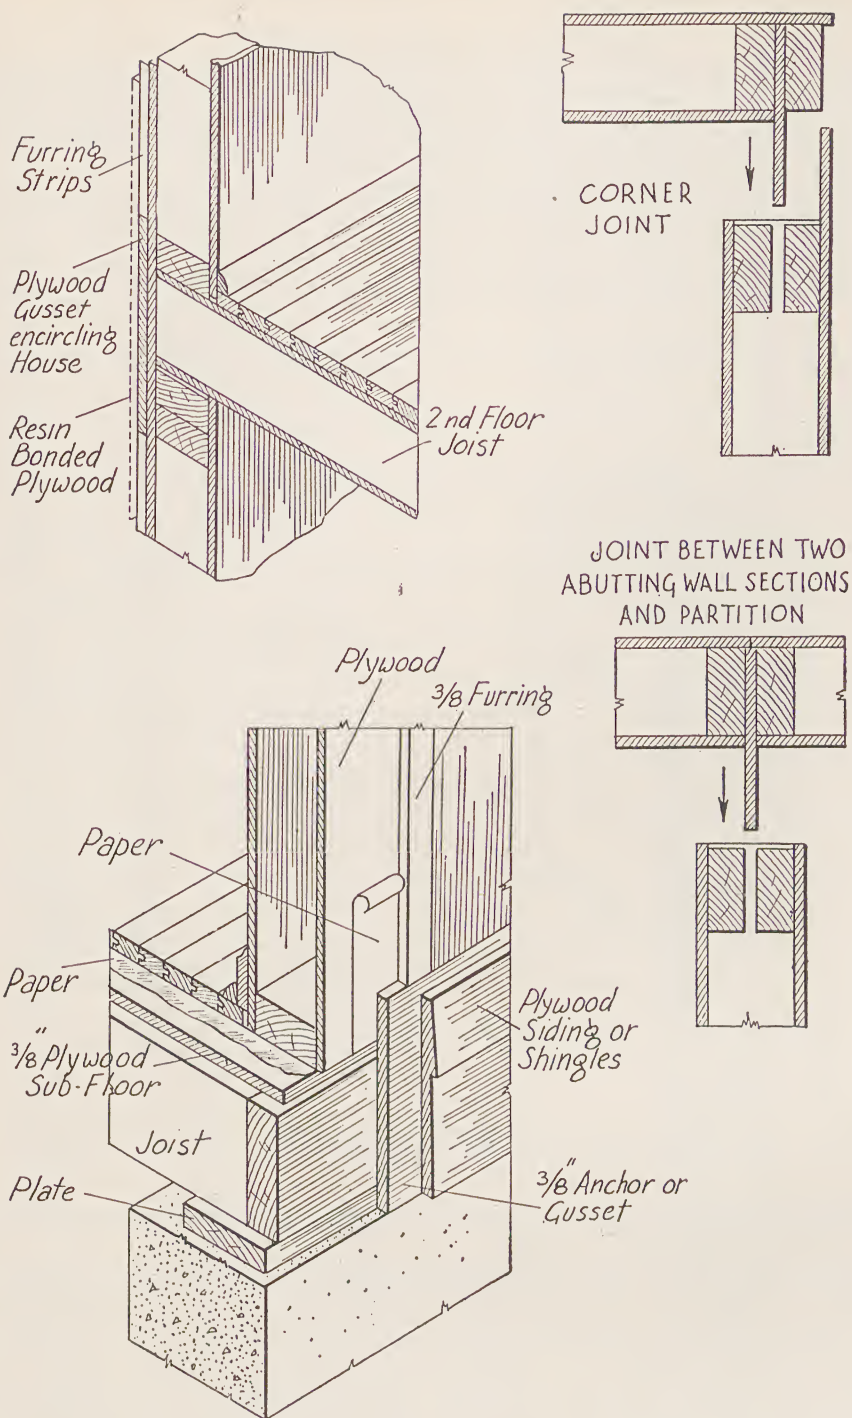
D.F.P. Dry-built house. Details of prefabricated timber construction.
